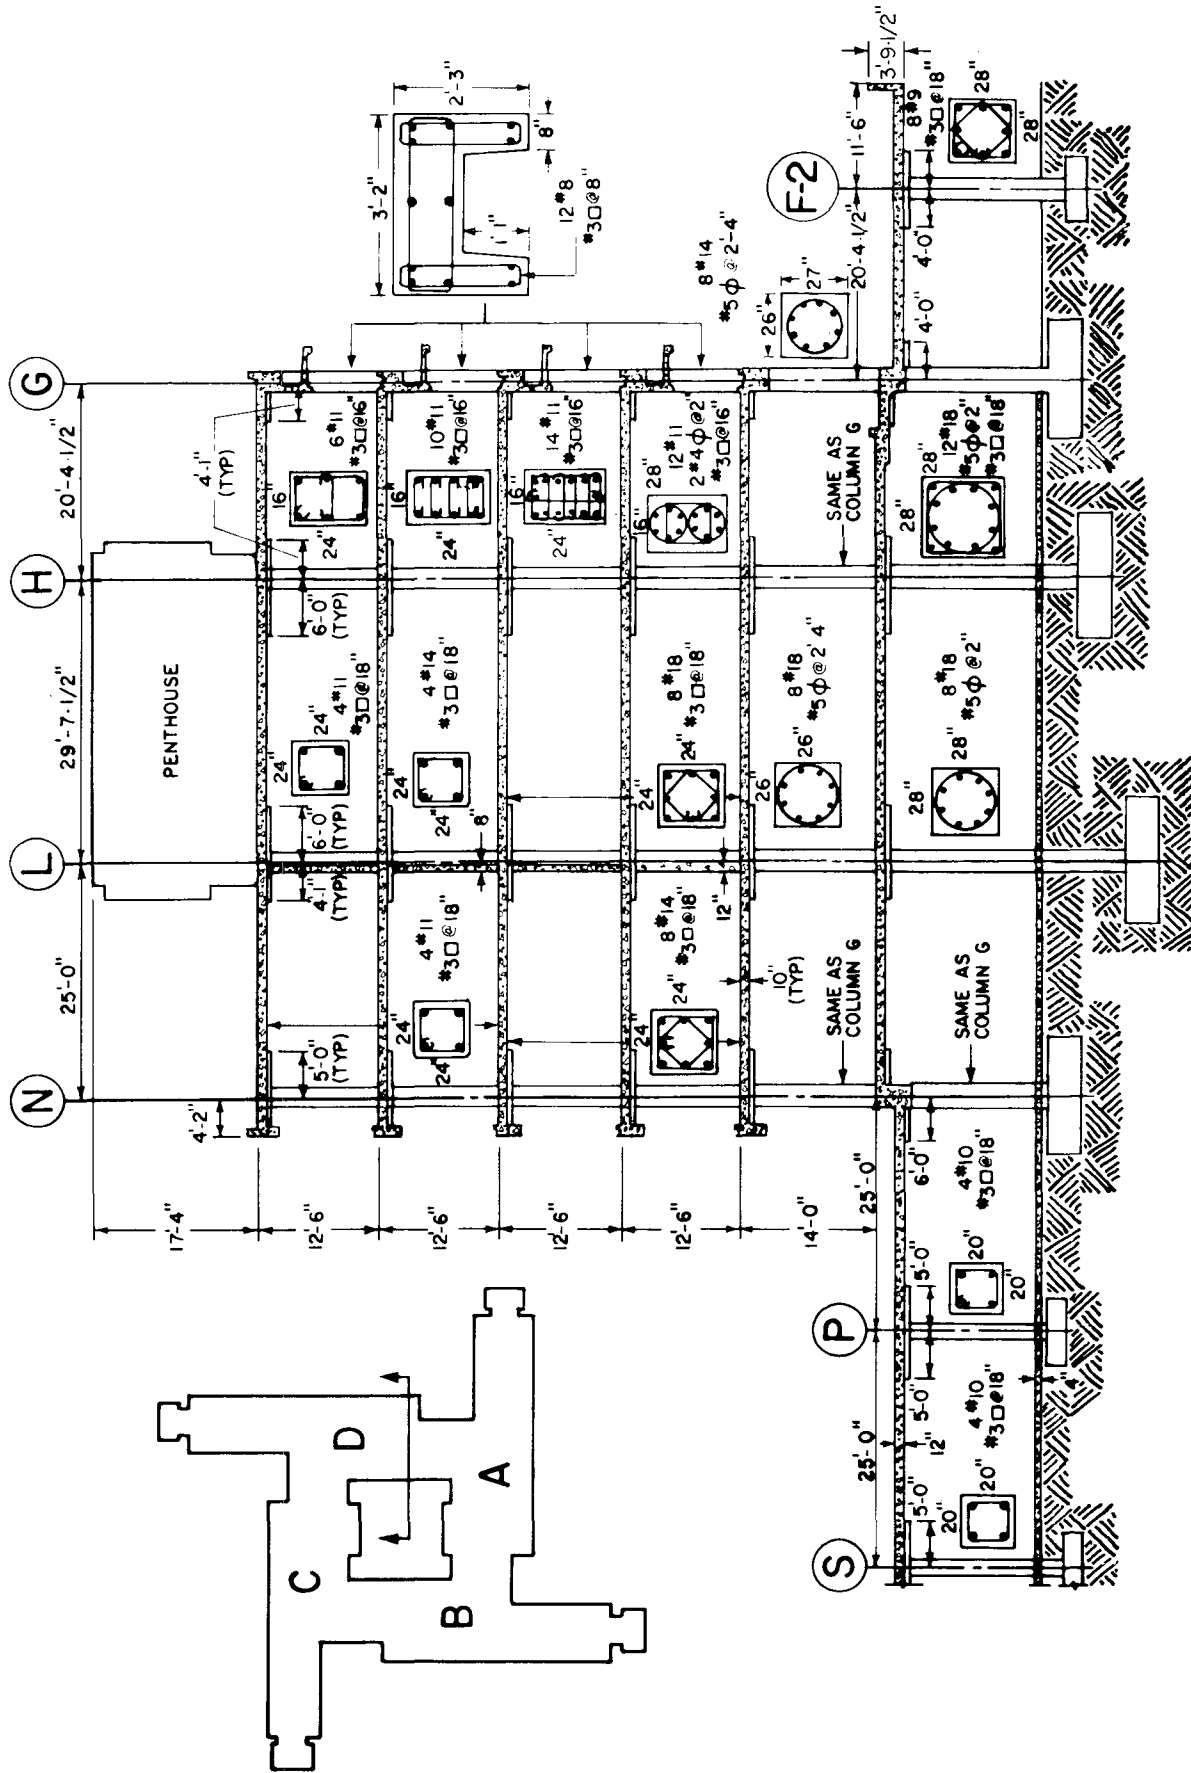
STRUCTURAL DETAIL AT FRAME 17, WING D
